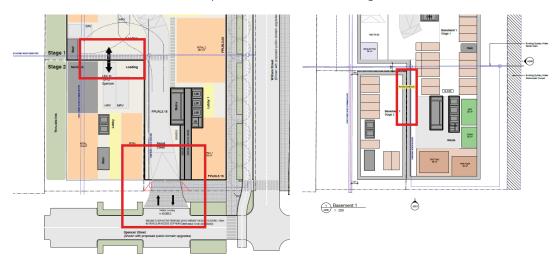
Indicative Development Concept Ground Floor Plan (access outlined in red)
